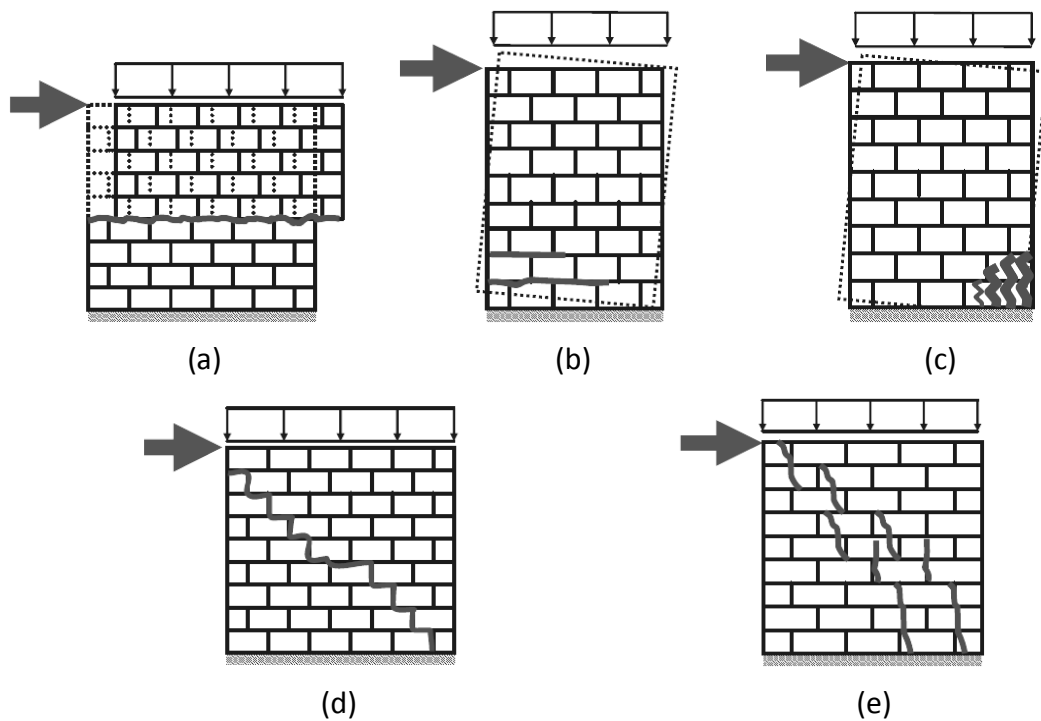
Static-monotonic tests on masonry walls; (a) bed joint sliding; (b) rocking; (c) toe crushing; (d) stepped cracking and (e) diagonal cracking [Mistler, 2006]
